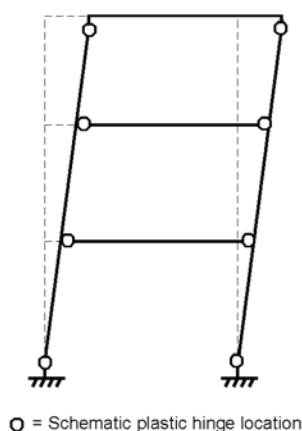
Acceptable plastic mechanism for multi-tier bent.
